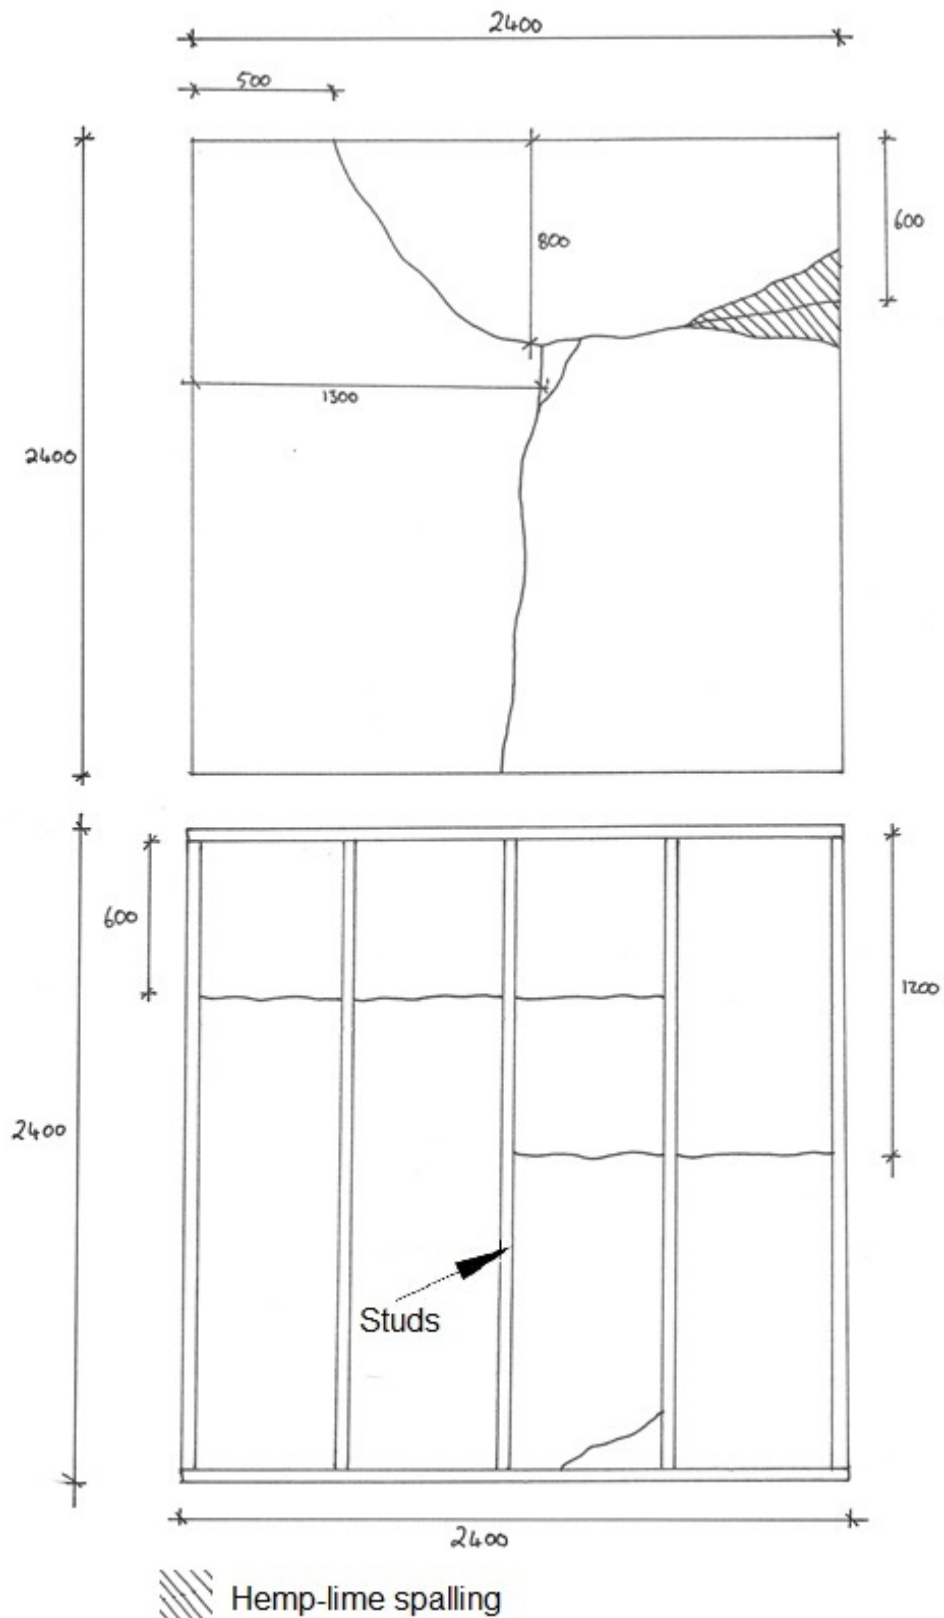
Damage to Wall R4 before testing (all dimensions in mm)
